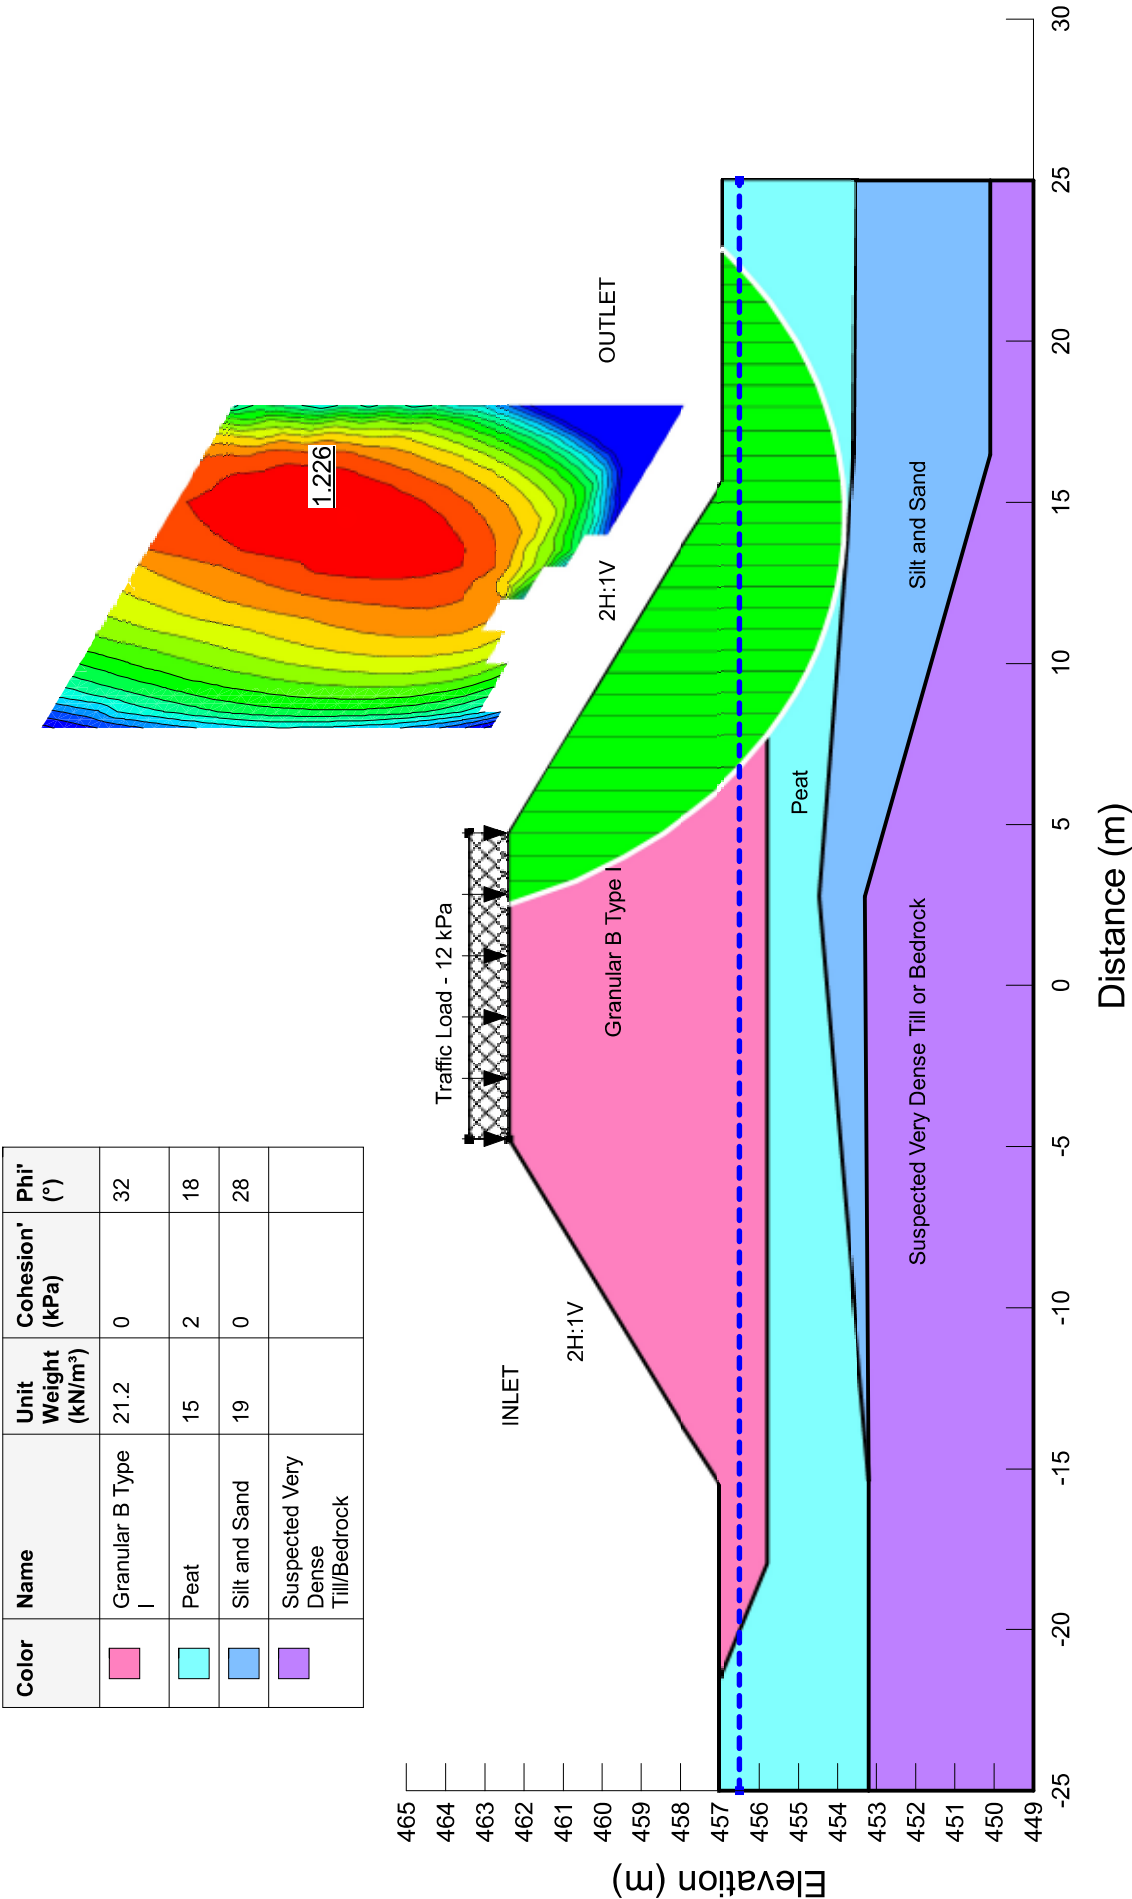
Existing Embankment Stability - Outlet Side
